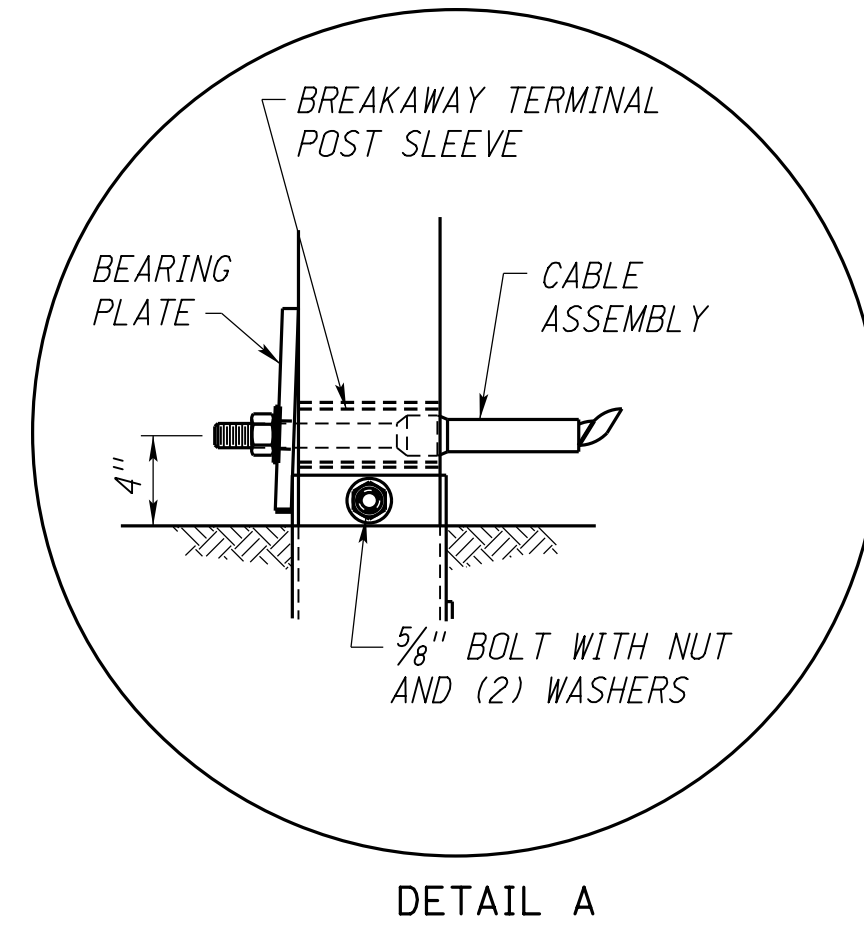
DETAILS OF CABLE ASSEMBLY (FCA01-02)
